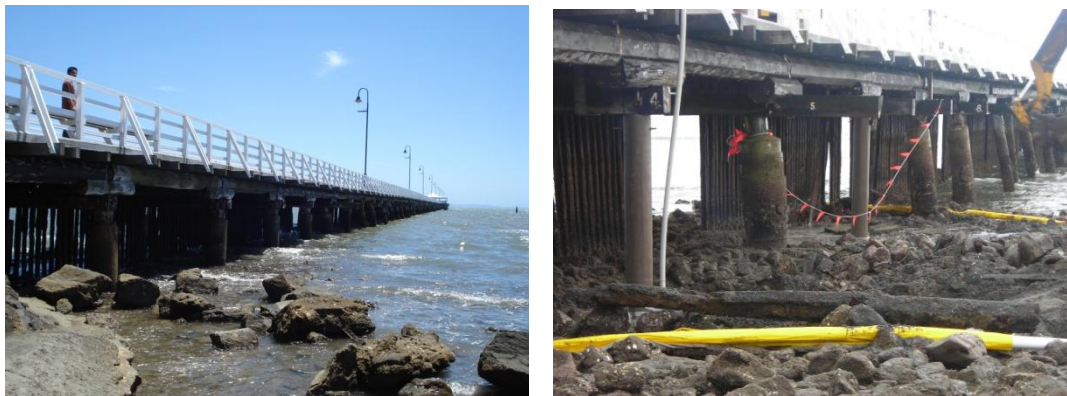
Deteriorated piles in Shorncliffe pier, Brisbane
